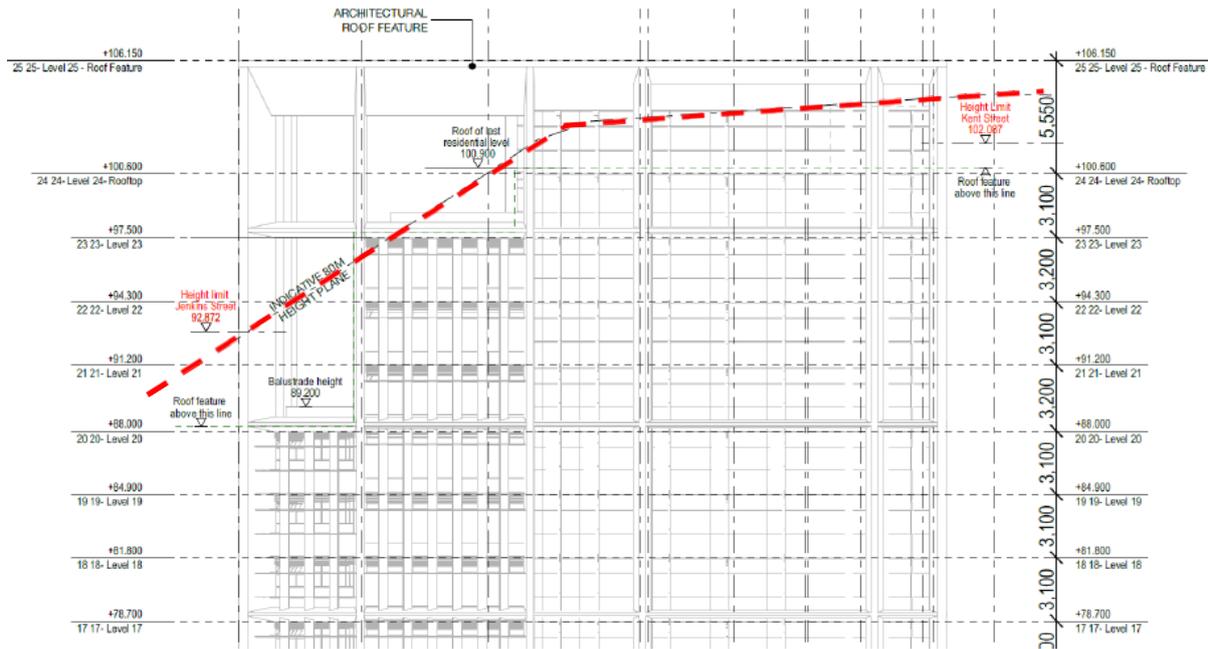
Section extract illustrating architectural roof feature elements exceeding the maximum 80 metre height plane
